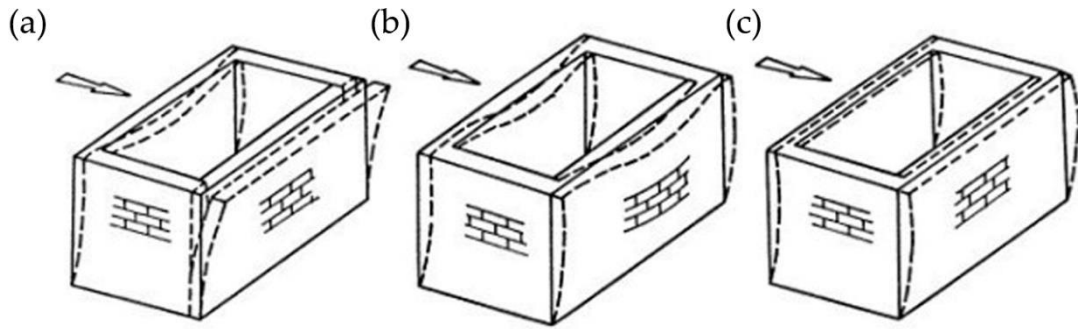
Overall behaviour in case of deformable floor and without curb (a), deformable floor with curb (b), rigid floor with curb (c) (Macchi G. Margenes G., 2002).
